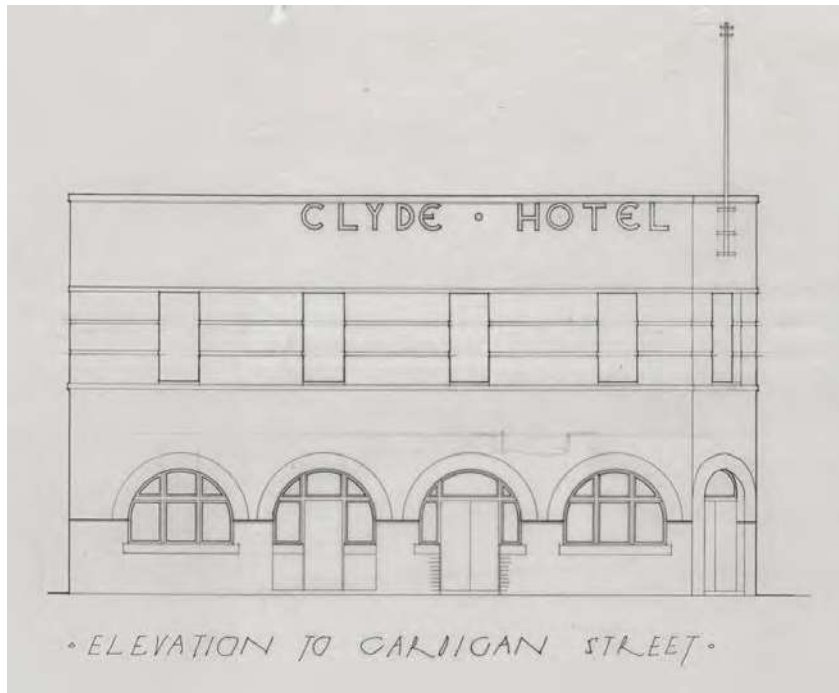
Detail of plan of 1940 renovation works to the Clyde Hotel, designed by Robert H McIntyre
